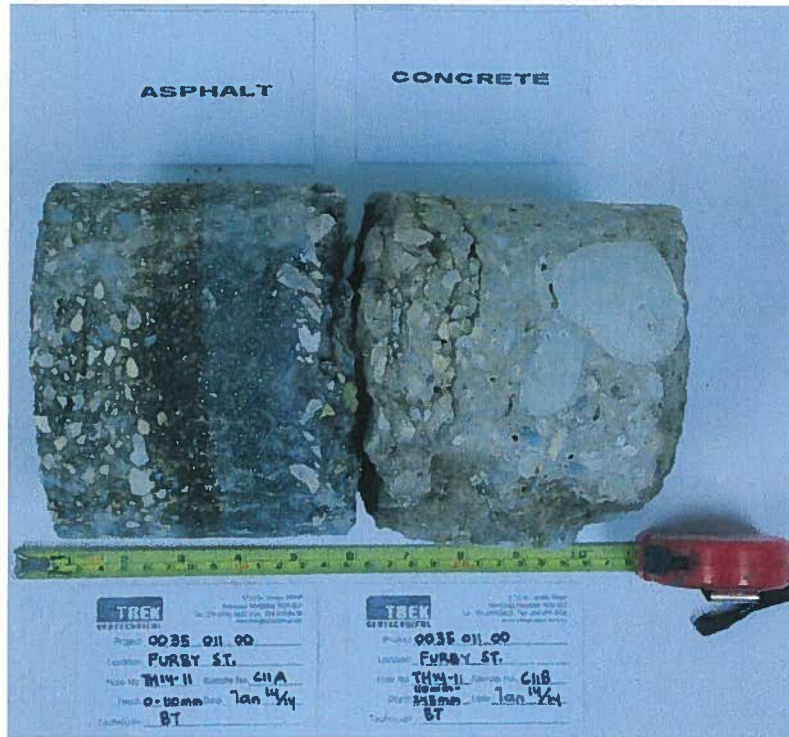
Asphalt and Concrete Core Sample from Test Hole TH14-11
